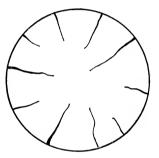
Soundness Pat Showing Shrinkage Cracks
